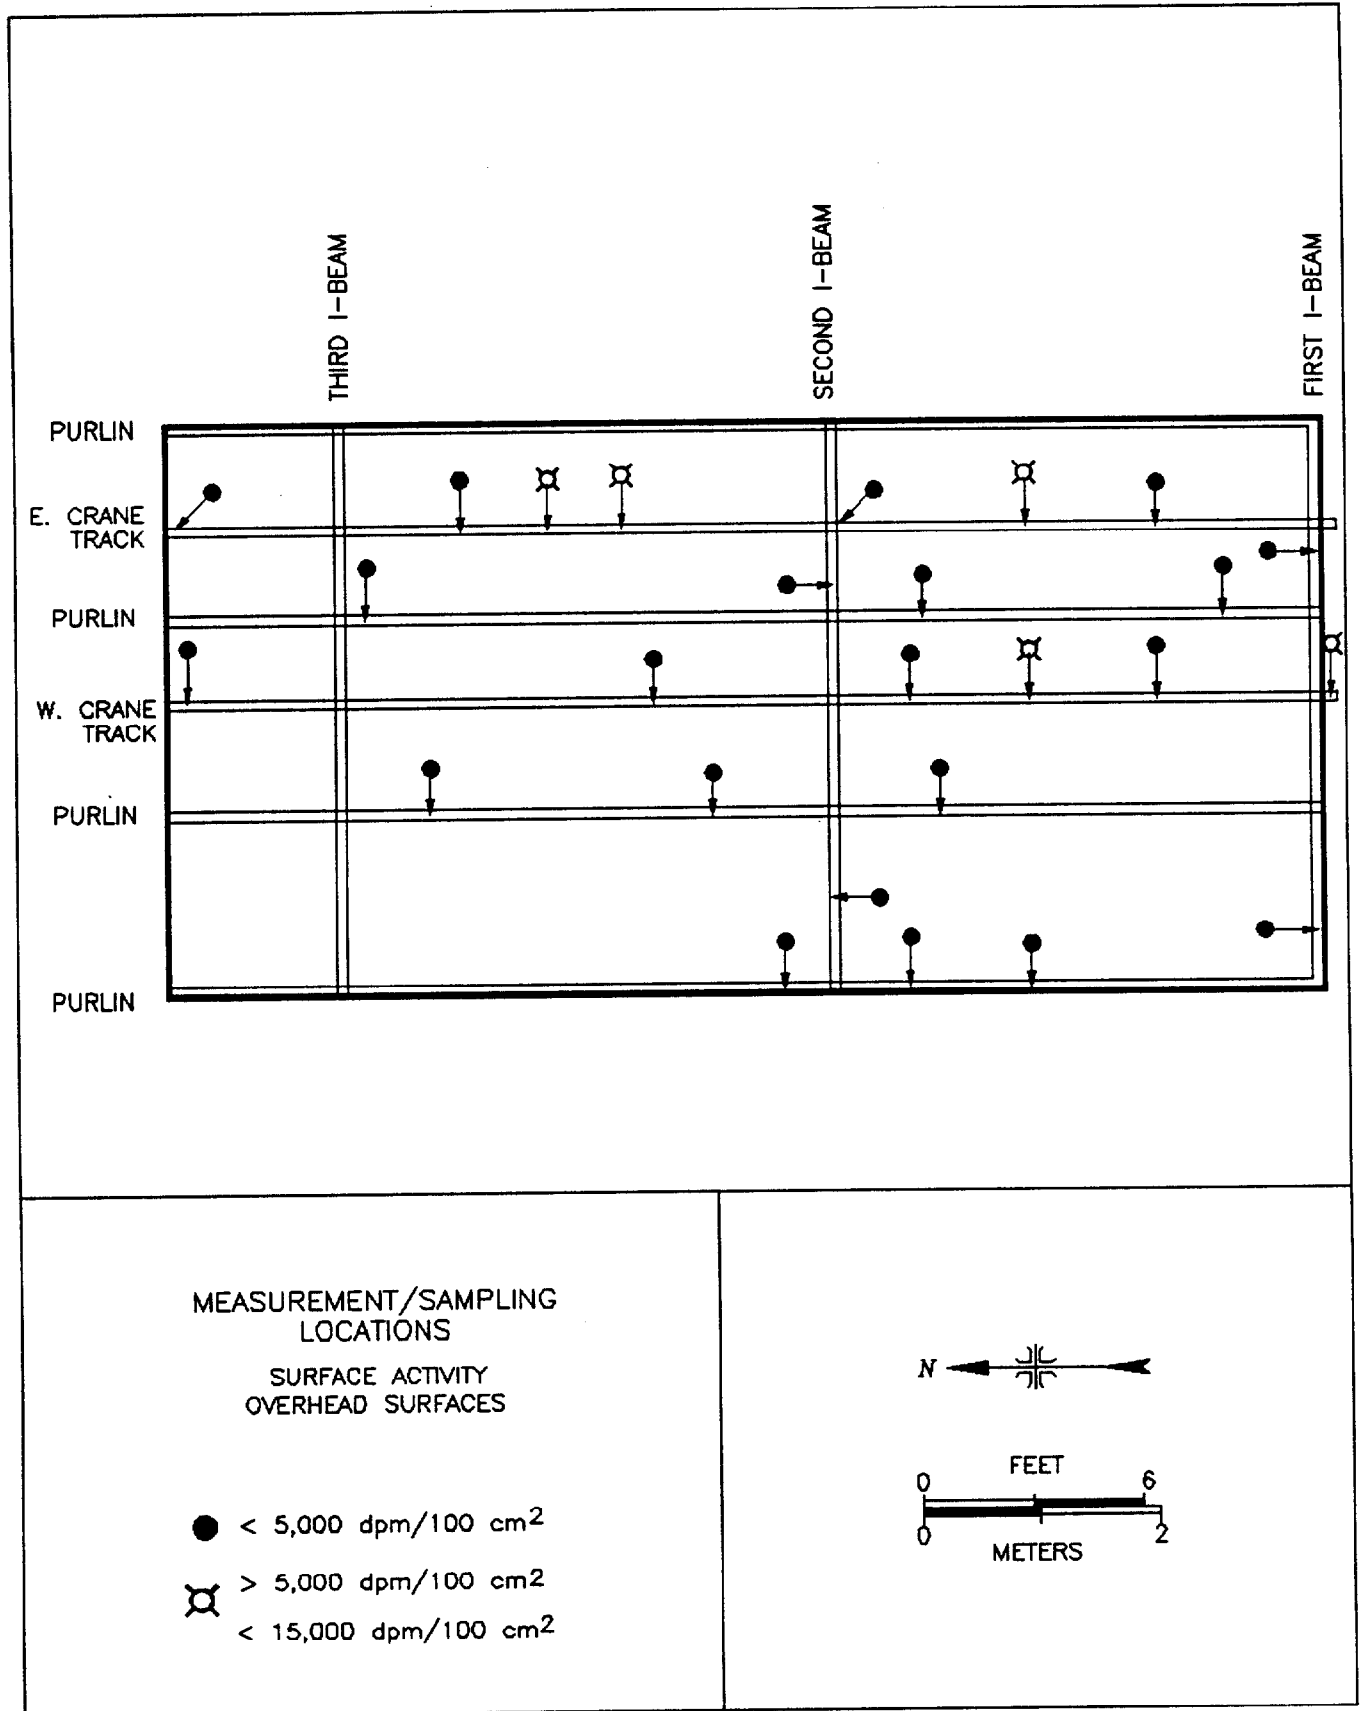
Building 8, Room B, Overheads – Measurement and Sampling Locations
